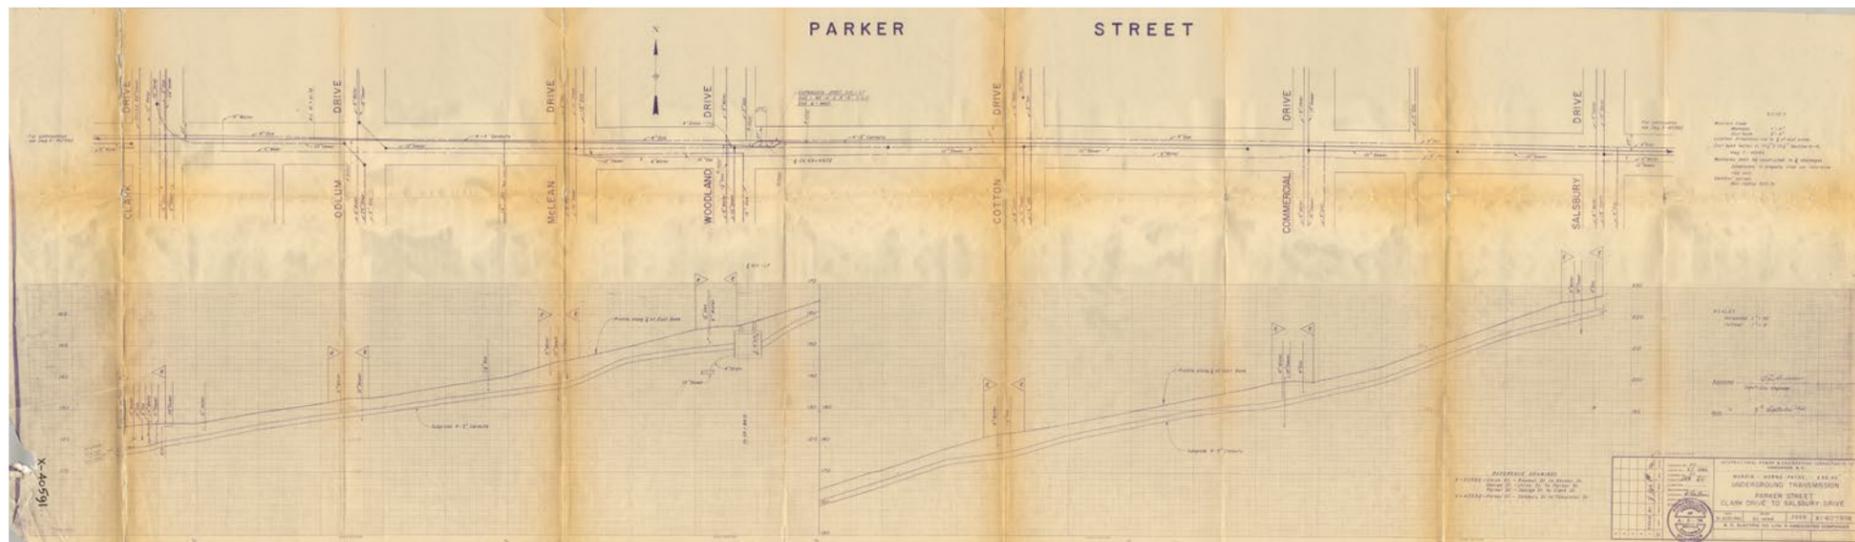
Parker Street BC Hydro R.O.W. as built drawings
